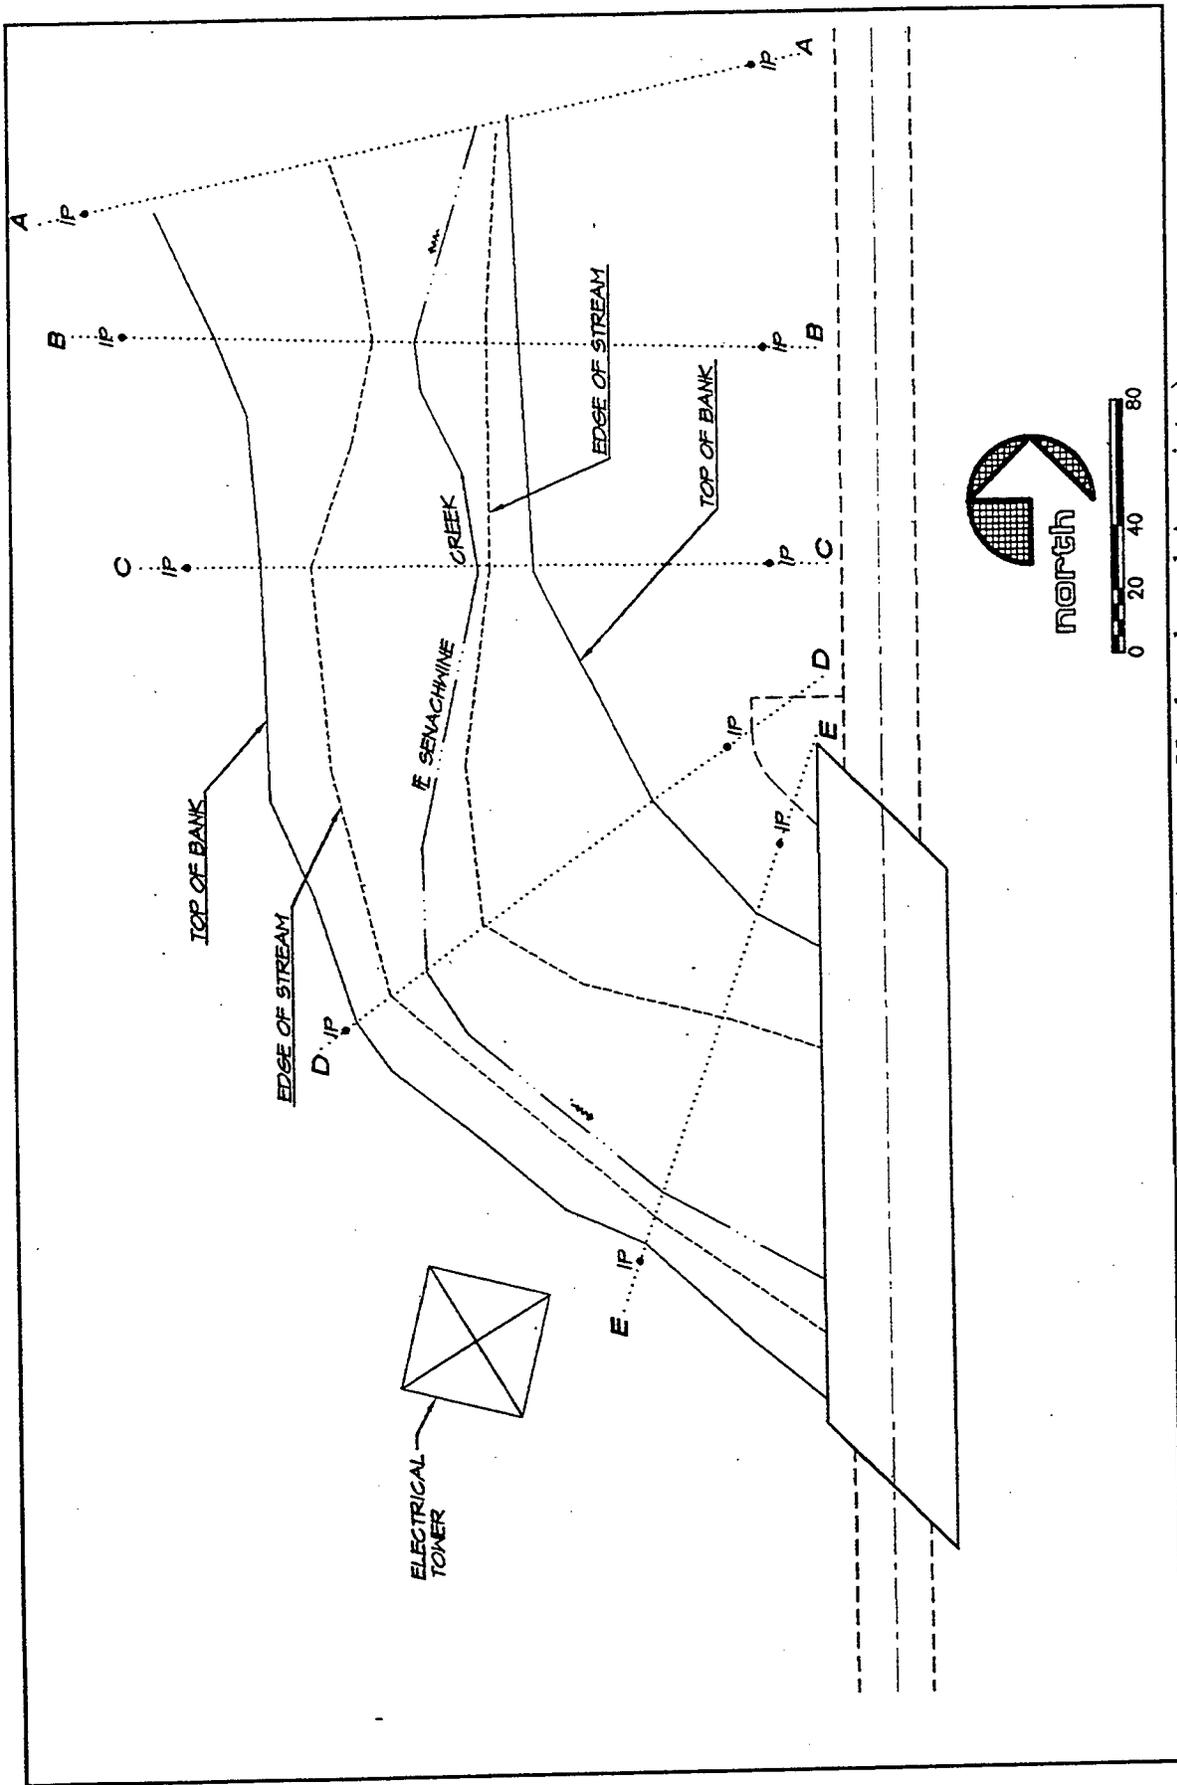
Plan survey of Senachwine Creek, July 1996. (Source: Upchurch and Associates)
